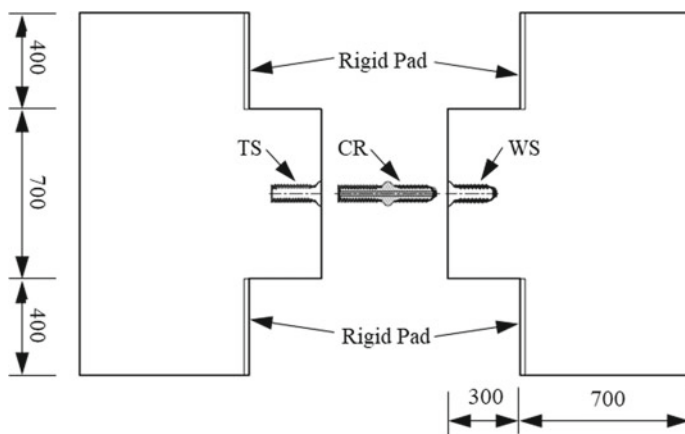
Plan view of T-shape loading beam (Unit: mm)
